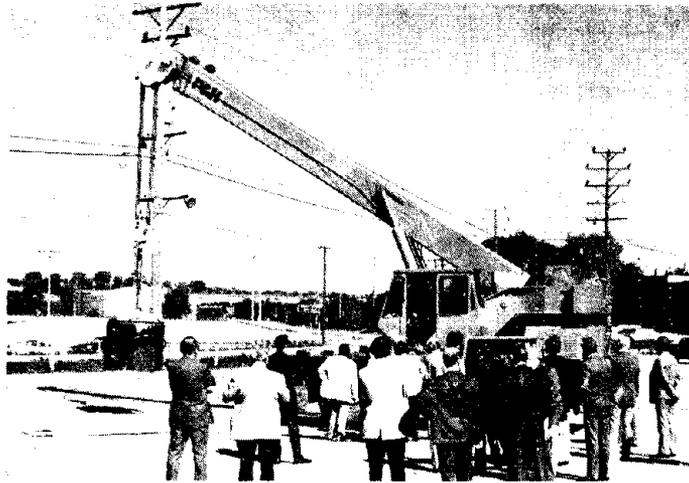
Crane driving toward power lines with suspended cement bucket
